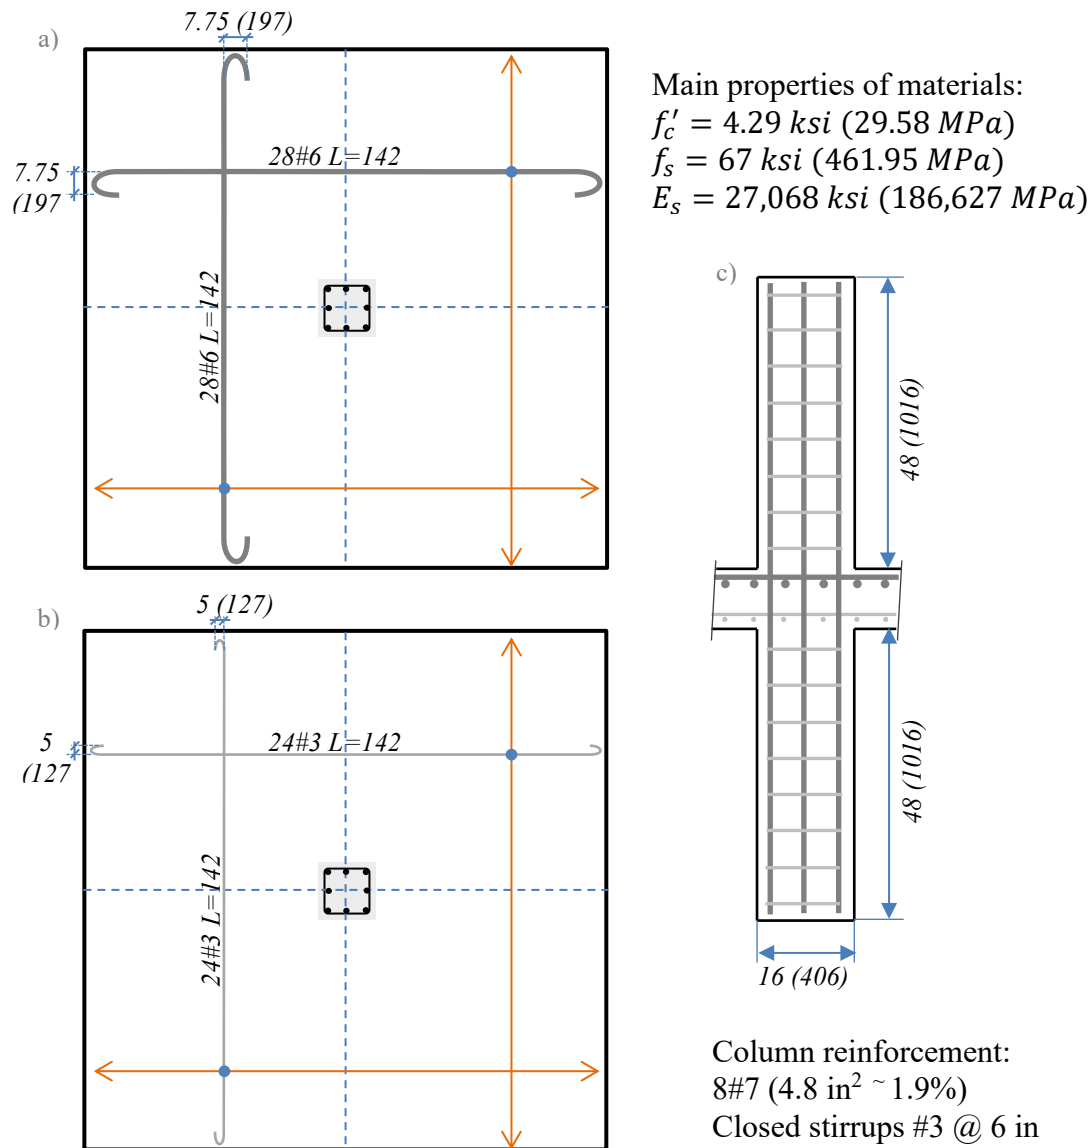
Main characteristics of specimen C-1.0. Detailing of: a) Top reinforcement; b) Bottom reinforcement; c) Column reinforcement.
